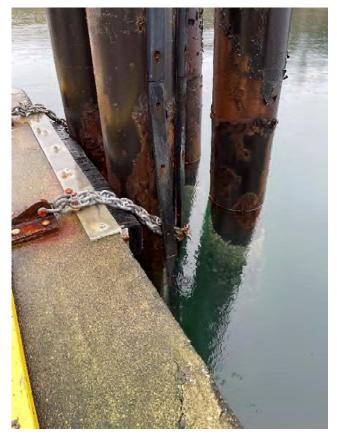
Chain rubbing on pile, UHMW rub rails failing
